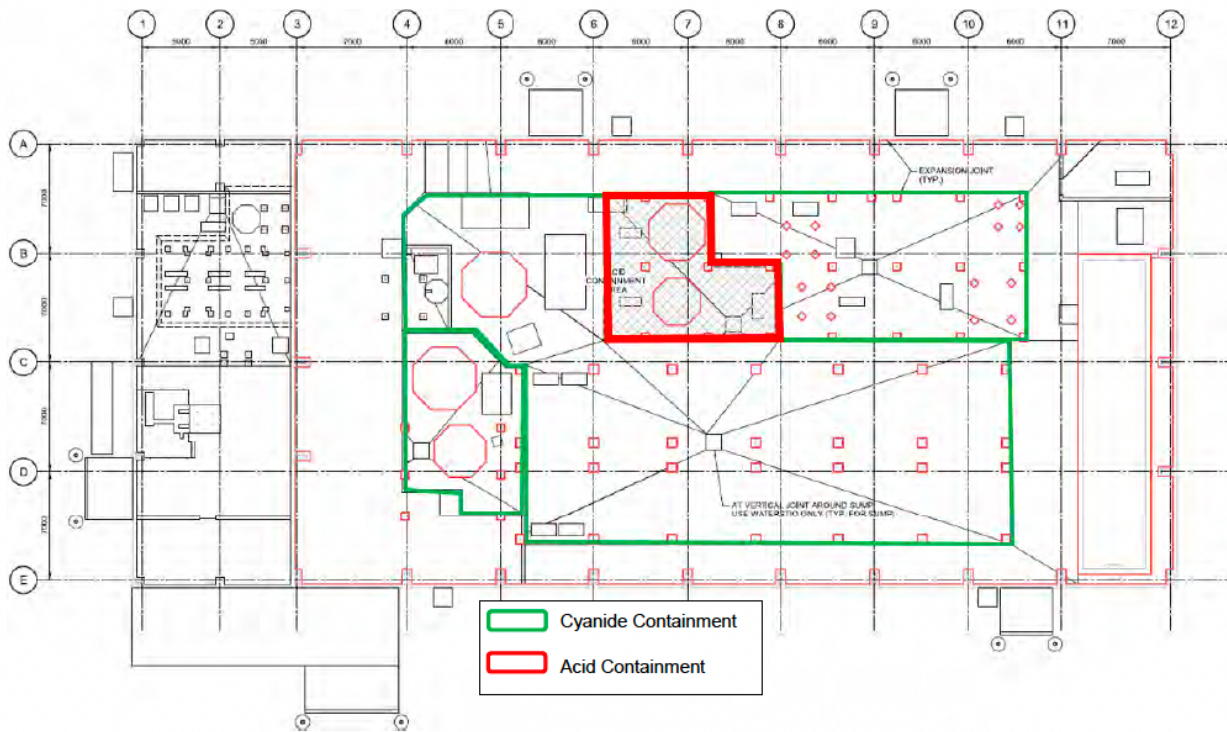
Cyanide Storage and Mixing Area Containment
